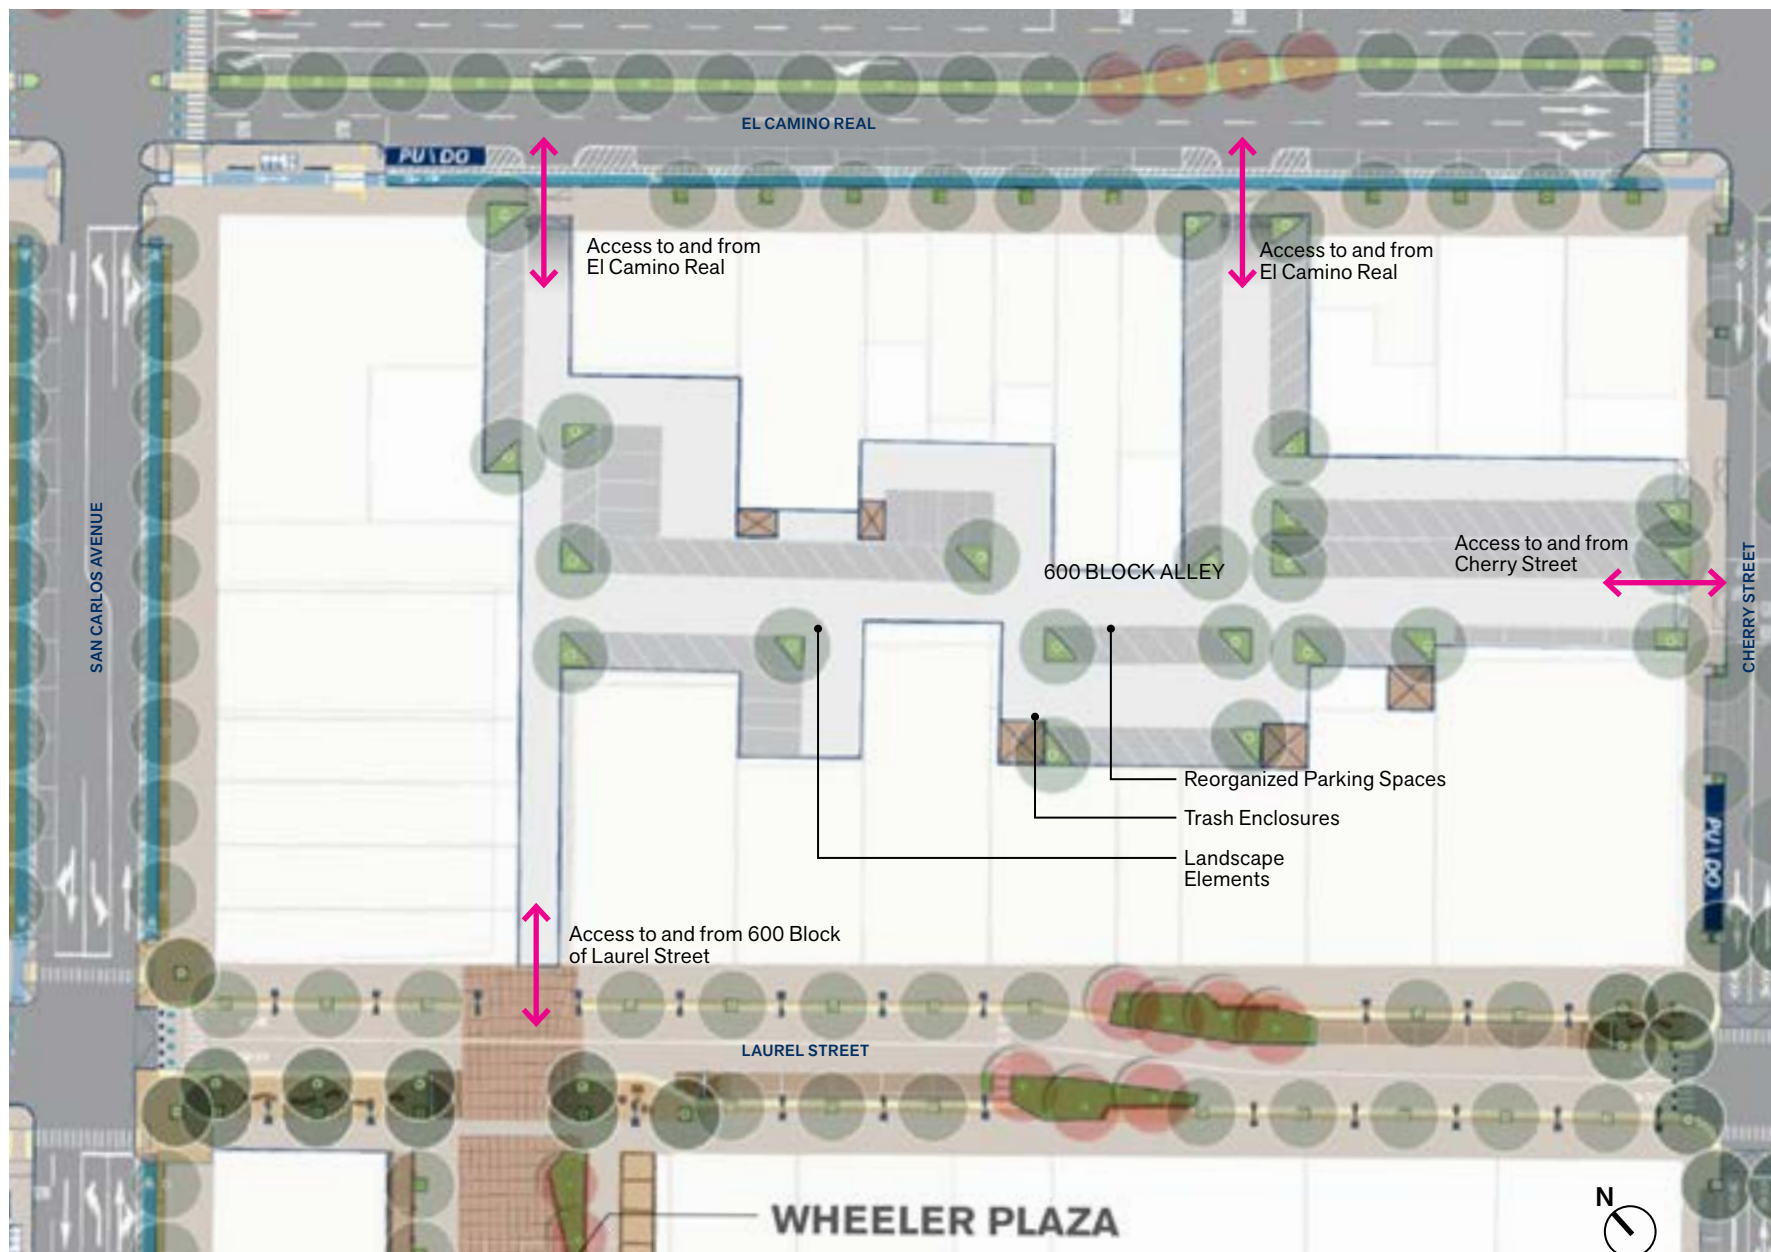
Alley/ Parking Area in 600 Block of Laurel Street
